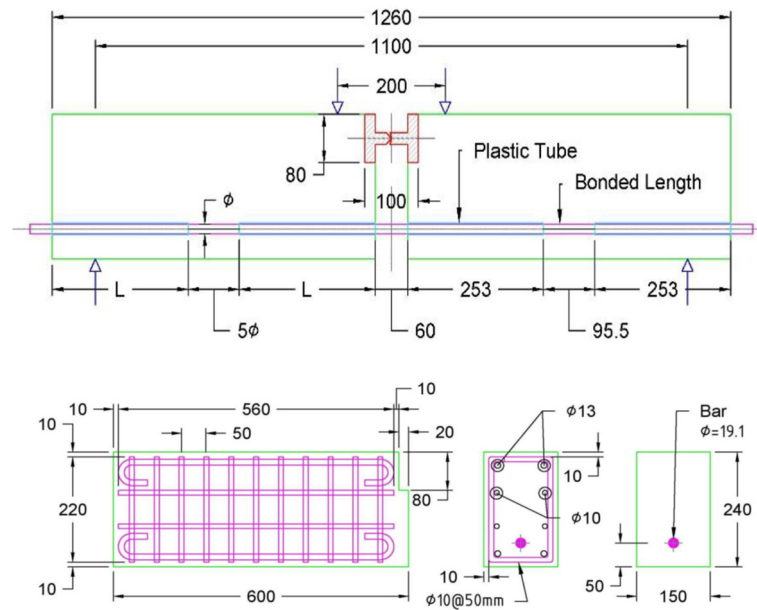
Detail of test specimen for bond test (all dimensions in mm)
